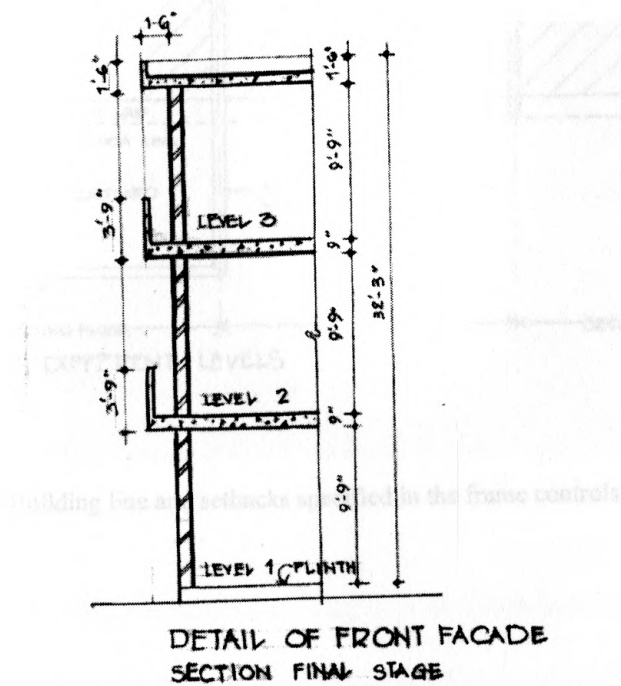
Permissible section heights and front façade detail according to the frame control sheets.
